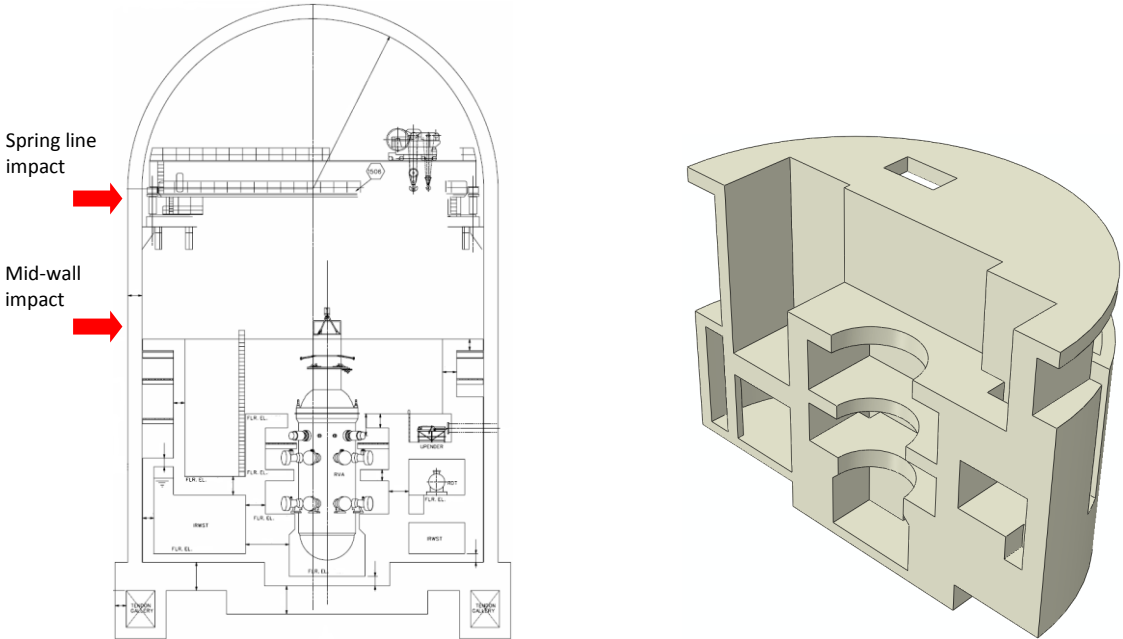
Sectional view of reactor containment building Figure 2.2. Internal concrete structure model
